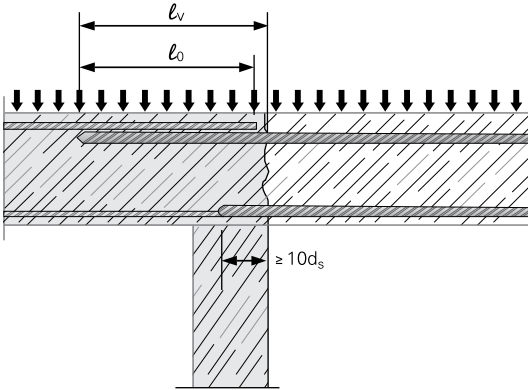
Overlap joint for rebar connections of slabs and beams.
